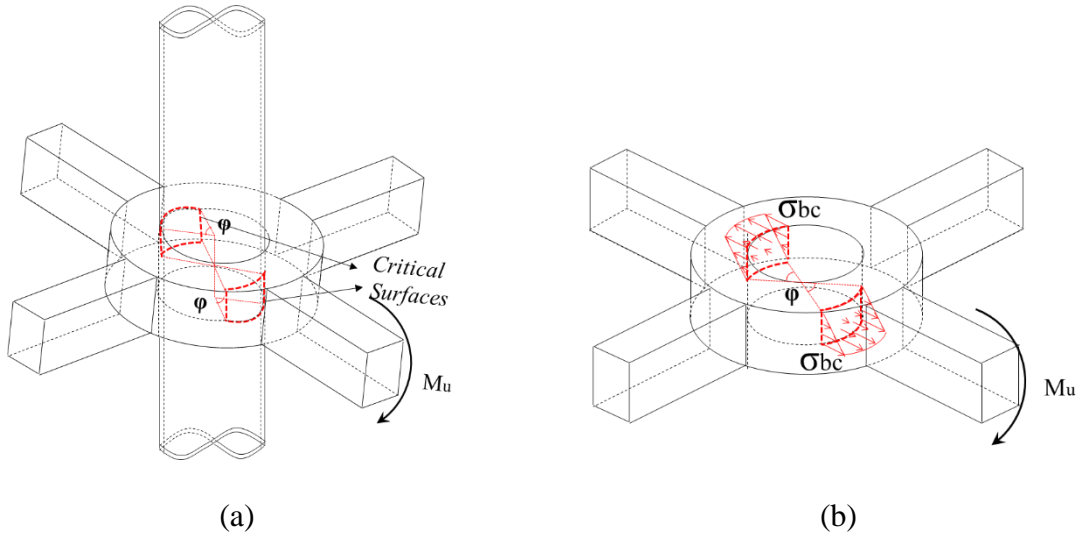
The SCCR joint failed by bearing crushing of the ring beam concrete
